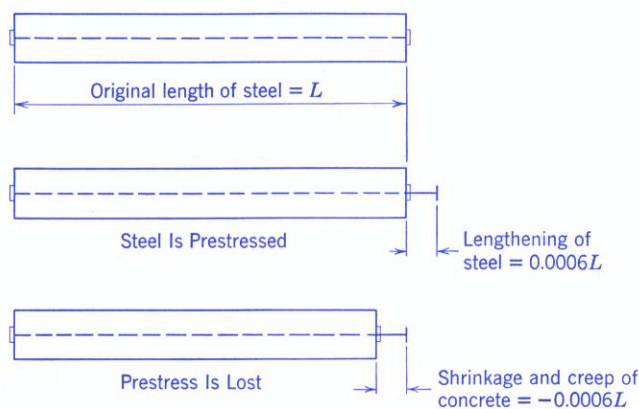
Prestressing with Ordinary Reinforcing Steel⁹
